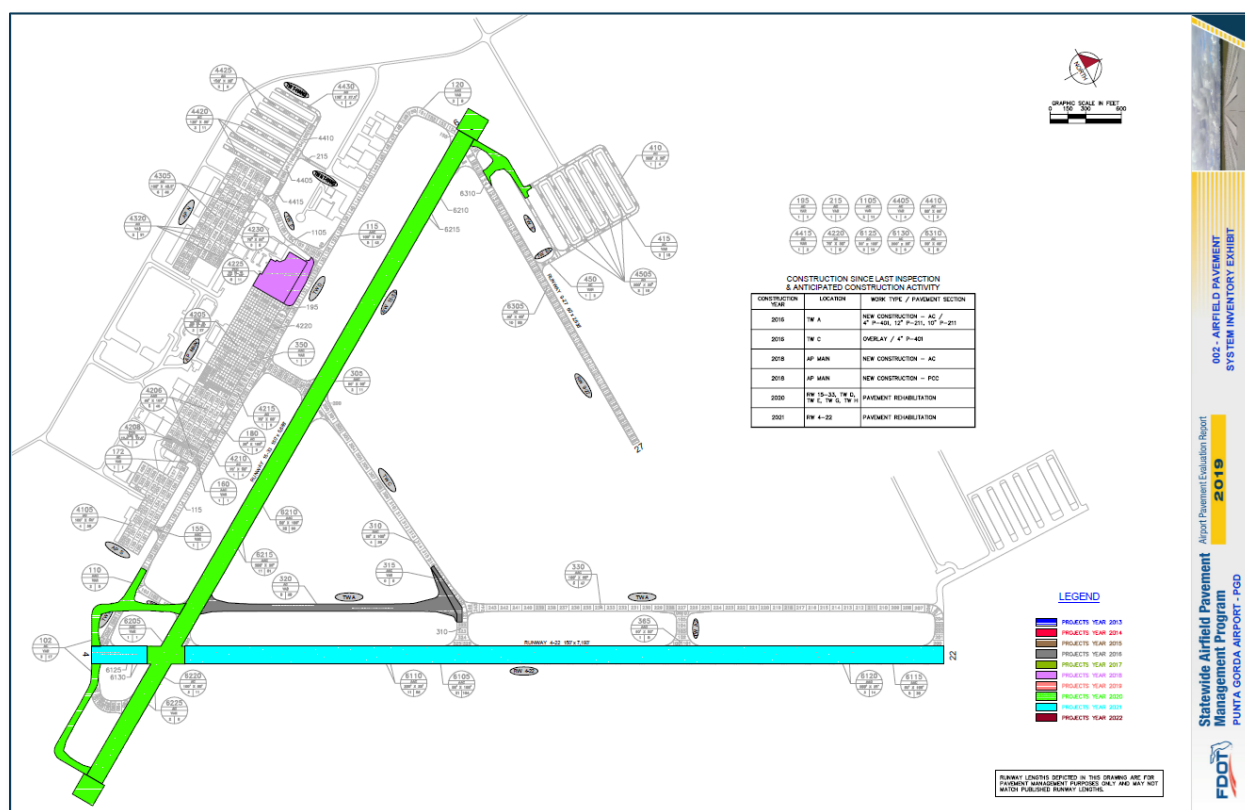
(a) 2019 Airfield Pavement Network Definition Exhibit
